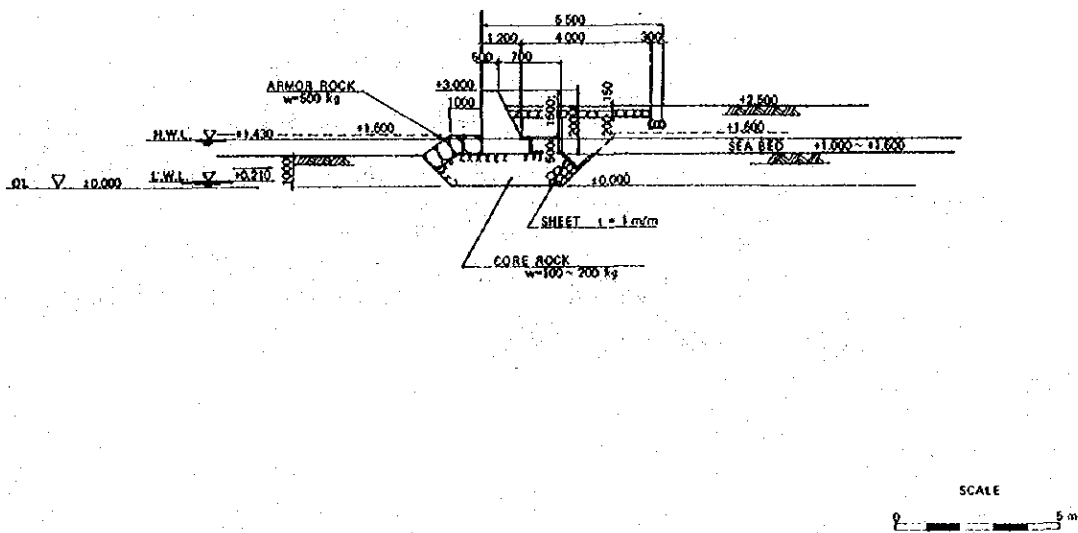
Cross Section of Rock Bulkhead – Lucena Port
